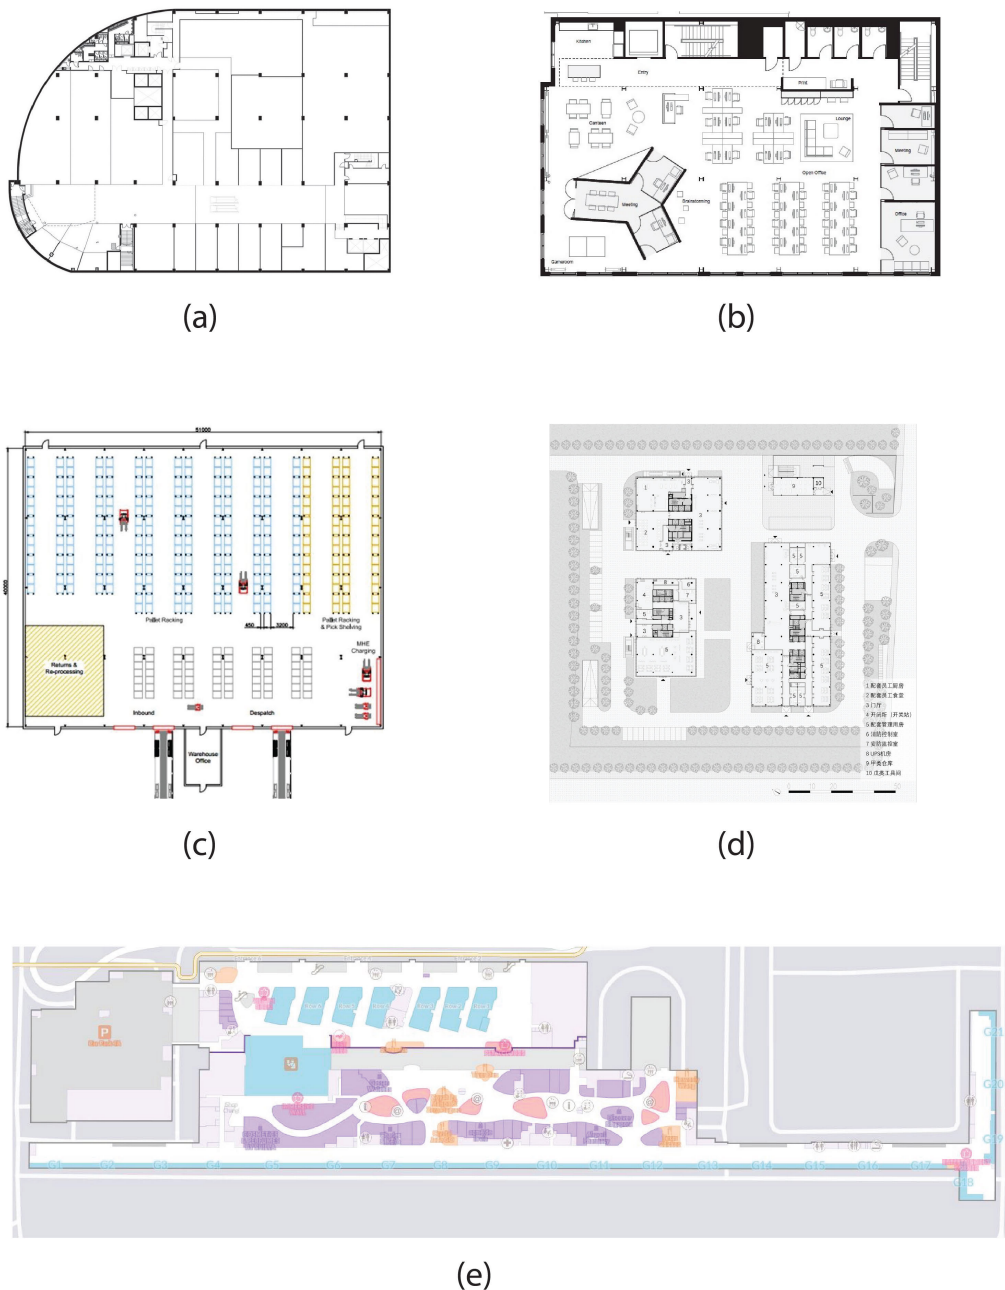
Reference sites used for validation - Site (a): Retail zone - the basement level of GRID shopping mall located in Singapore [75], Site (b): office - FINE Design Group [76], Site (c) - Industrial warehouse design [77], Site (d): Mixed use building - Smart New World Innovation Center, a mixed use building [78], and Site (e): Airport - Level 2 of Singapore’s Changi Airport Terminal 4 [79], images not to scale to each other.
